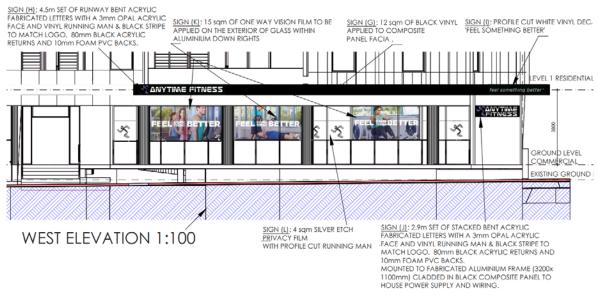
Western elevation of Shop 1 fronting Princes Highway. Proposed shop front and awning signage.
